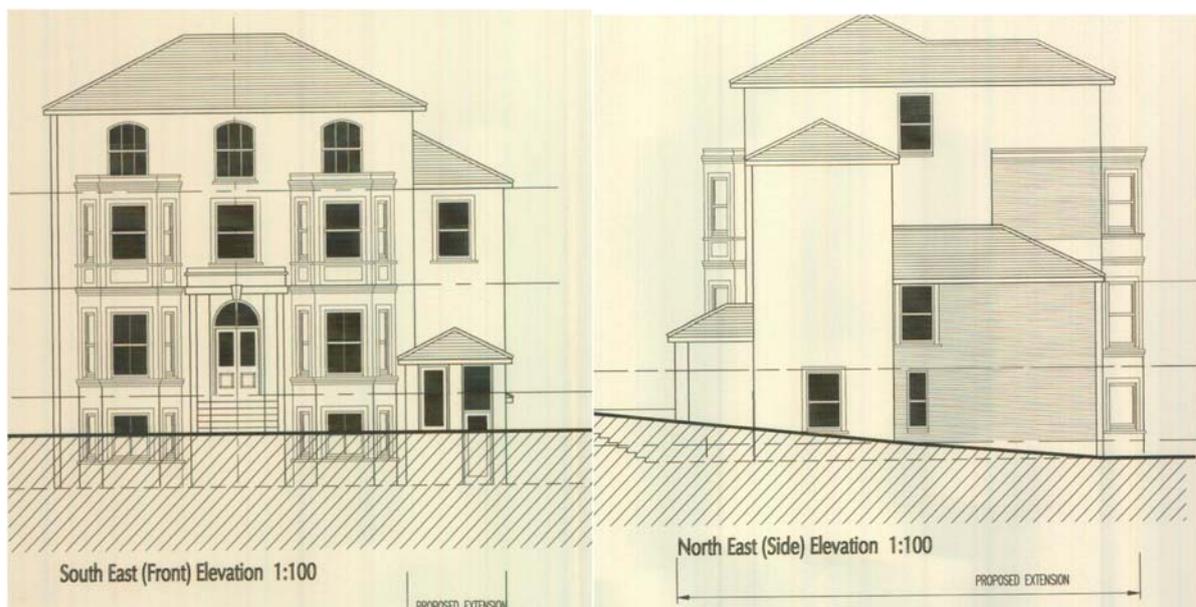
Front and flank elevation of the previously refused side extension ref 16/02542/P
